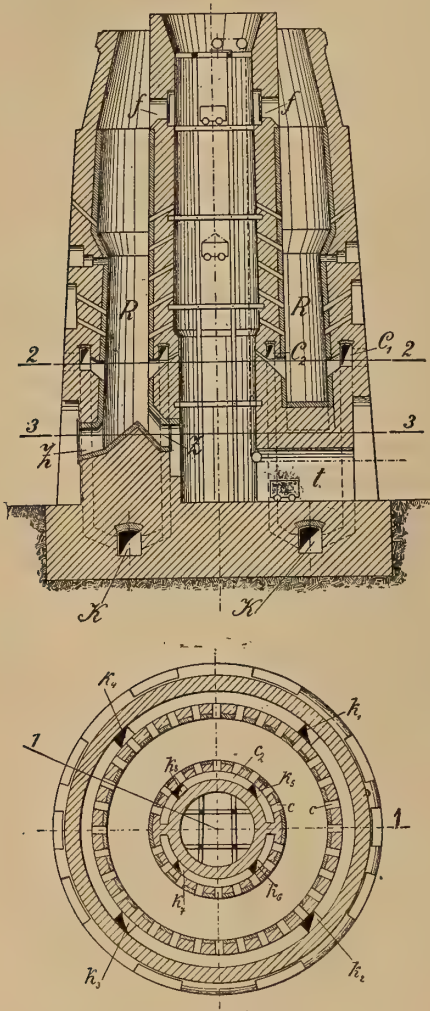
PLAN AND VERTICAL SECTION OF SCHMATOLLA KILN
